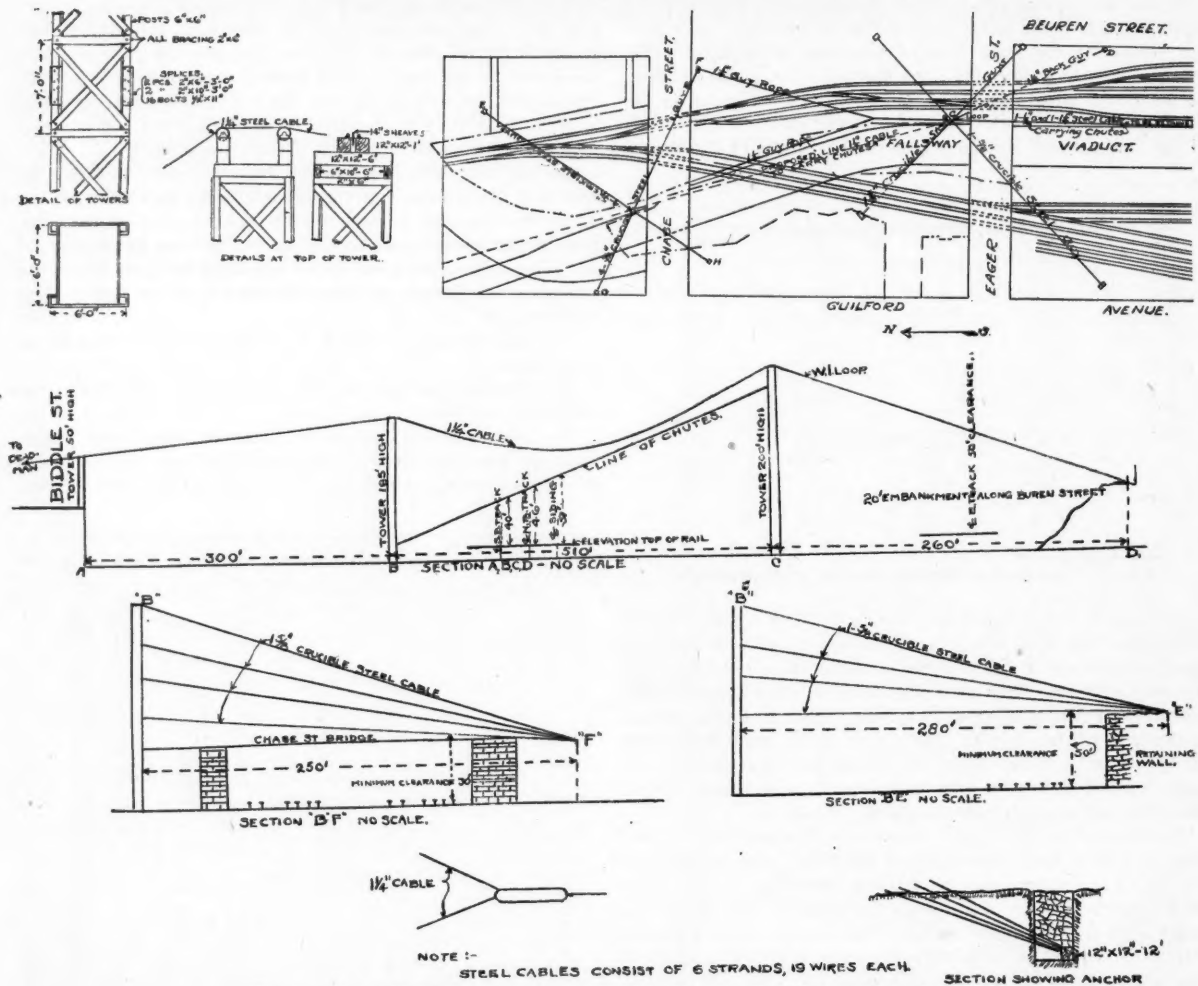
Plan and Sections of Concrete Distributing Plant, Fallaway Viaduct.
